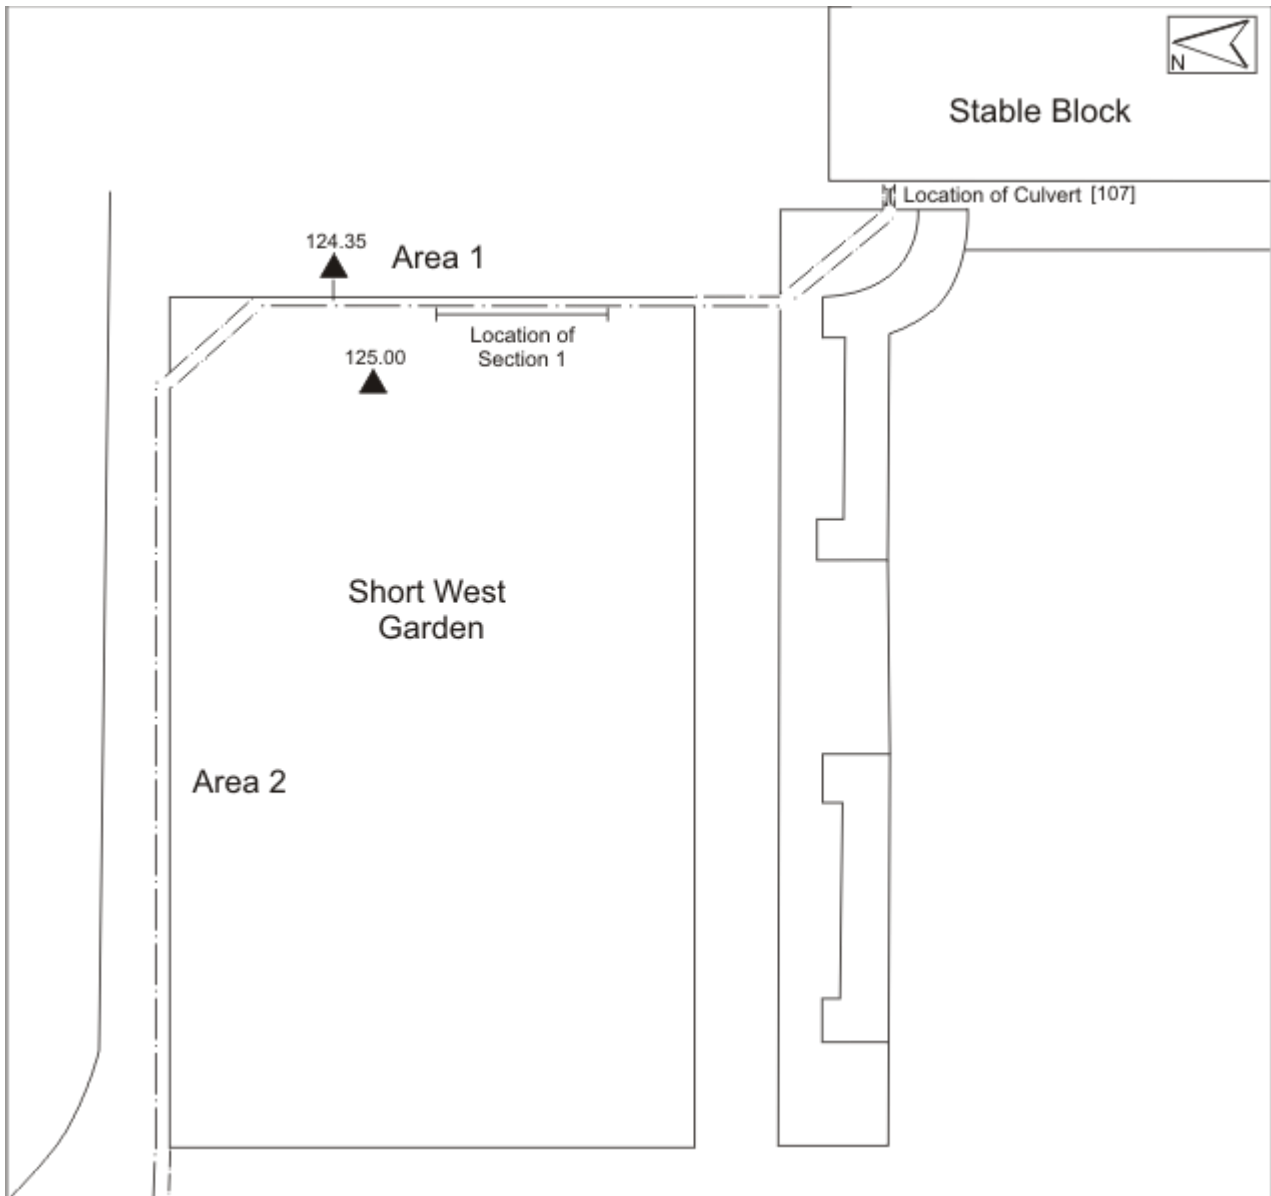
Detail Showing Location of Section One (Scale 1:300)
